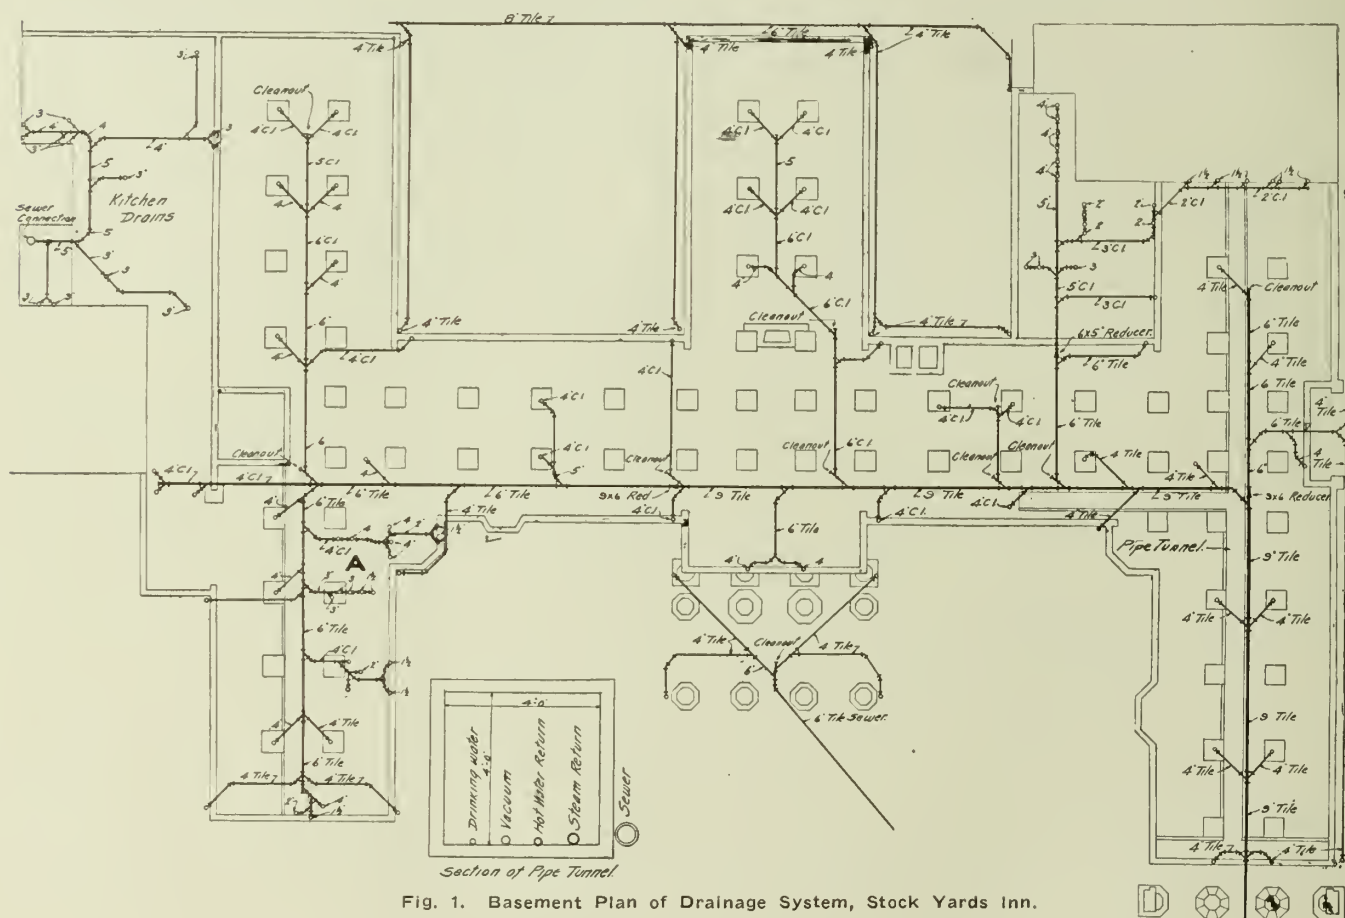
Basement Plan of Drainage System, Stock Yards Inn.
